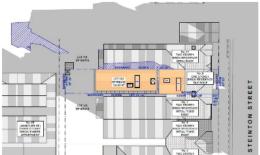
Shadow Diagram at 9am (21 June) depicting the extent of new shadows in blue.
